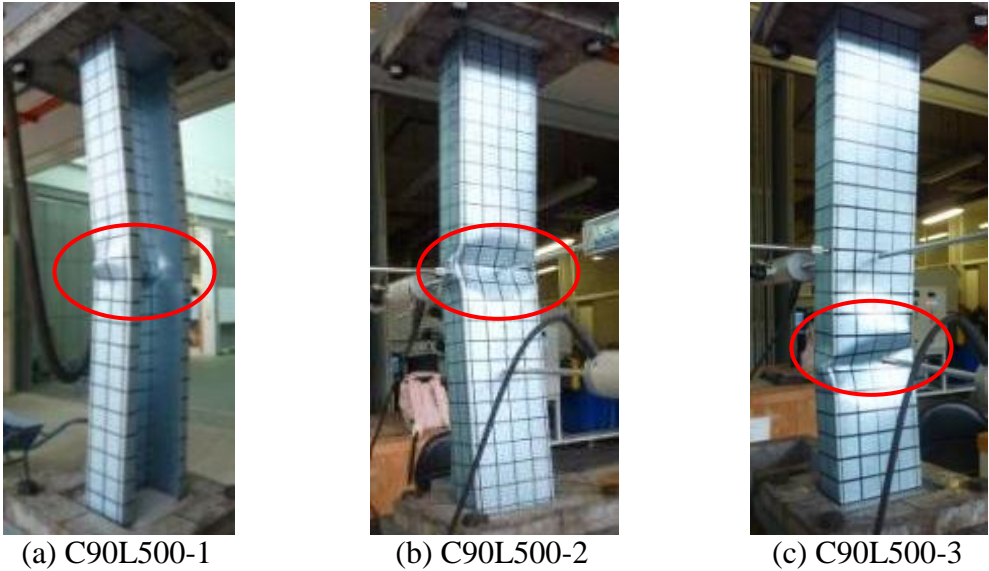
Failure Modes of Tested C90L500 C-channel Columns
